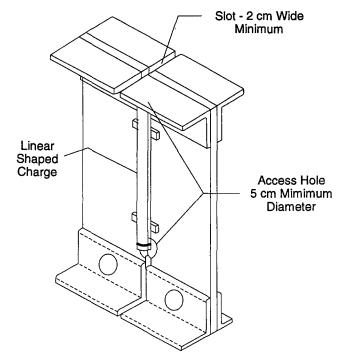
Preparation Details for Explosive Cutting of Steel Girder
